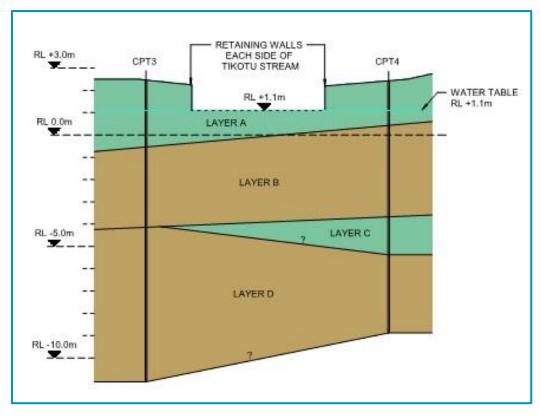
Geotechnical Cross Section 2 (see also Appendix E)
